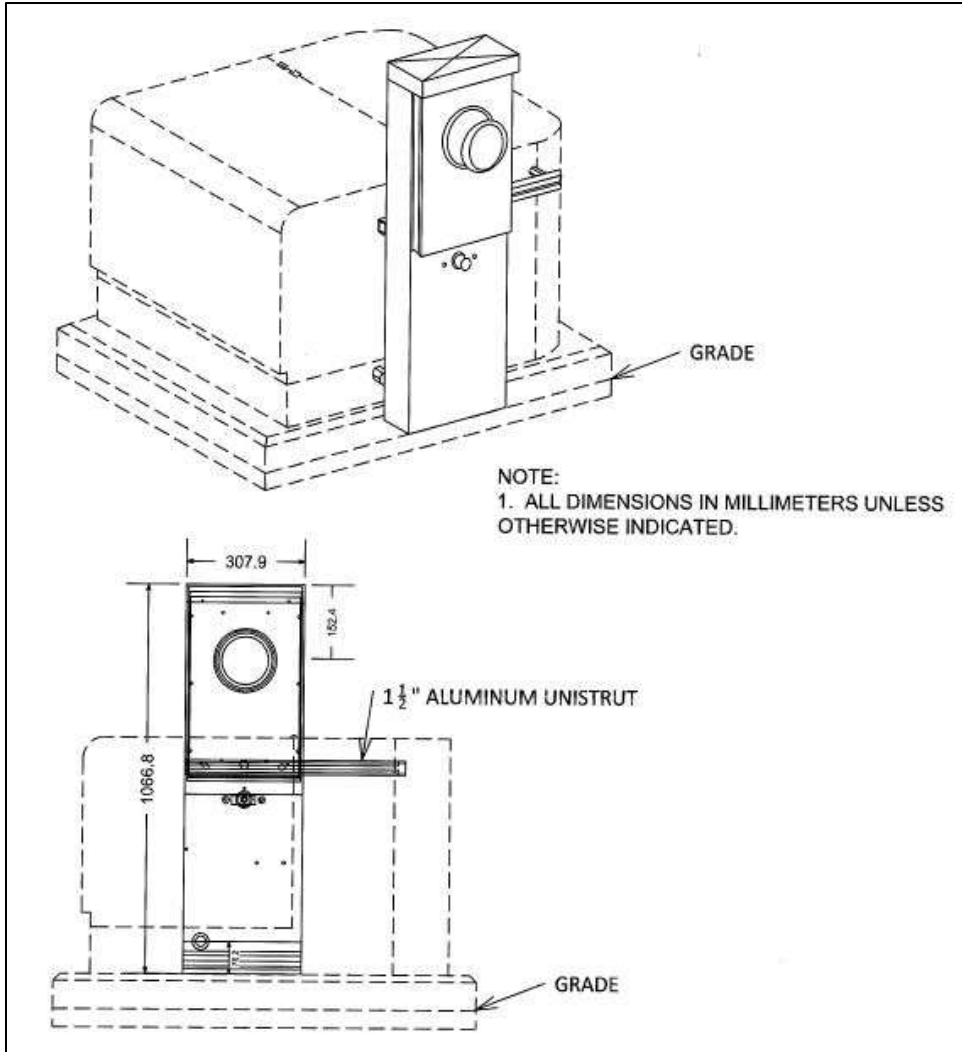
Single-Phase Instrument Metering Stand on Pad-Mount Transformer (1)
